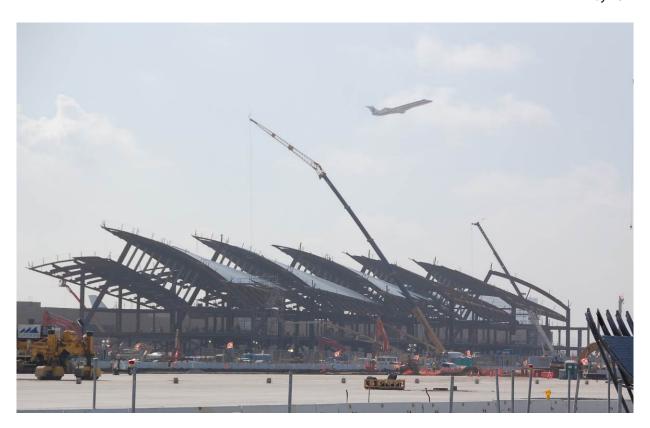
Bradley West Project Under Construction at LAX
